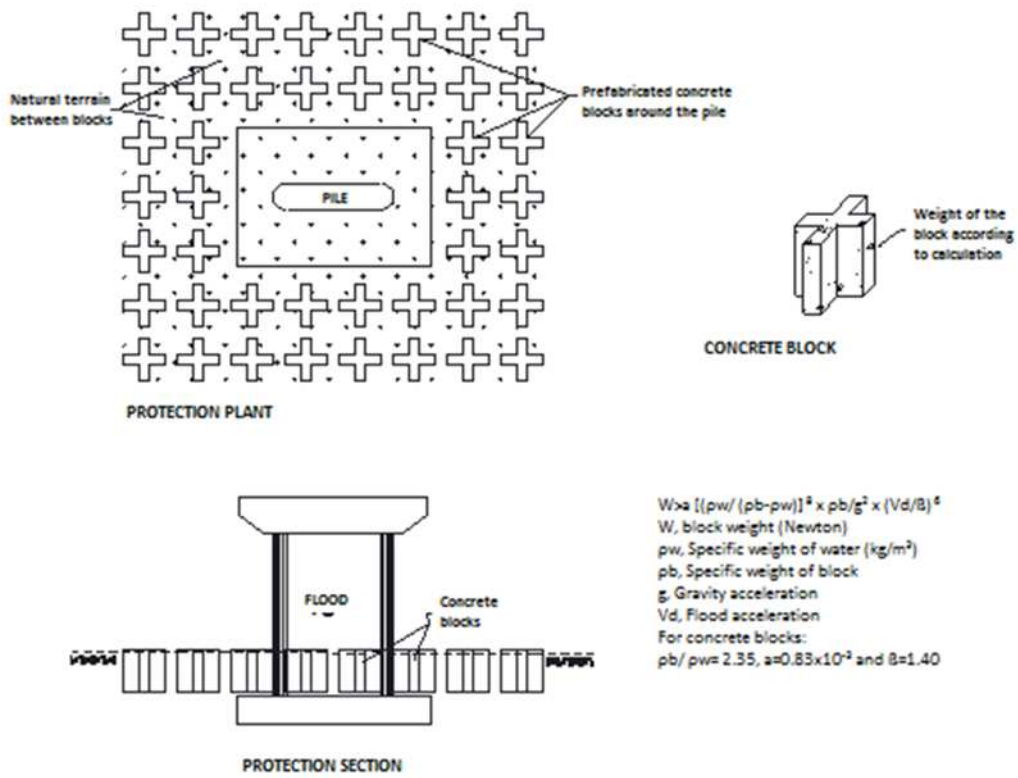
Local protection in piles using prefabricated concrete blocks. (SPOP, 2014)
